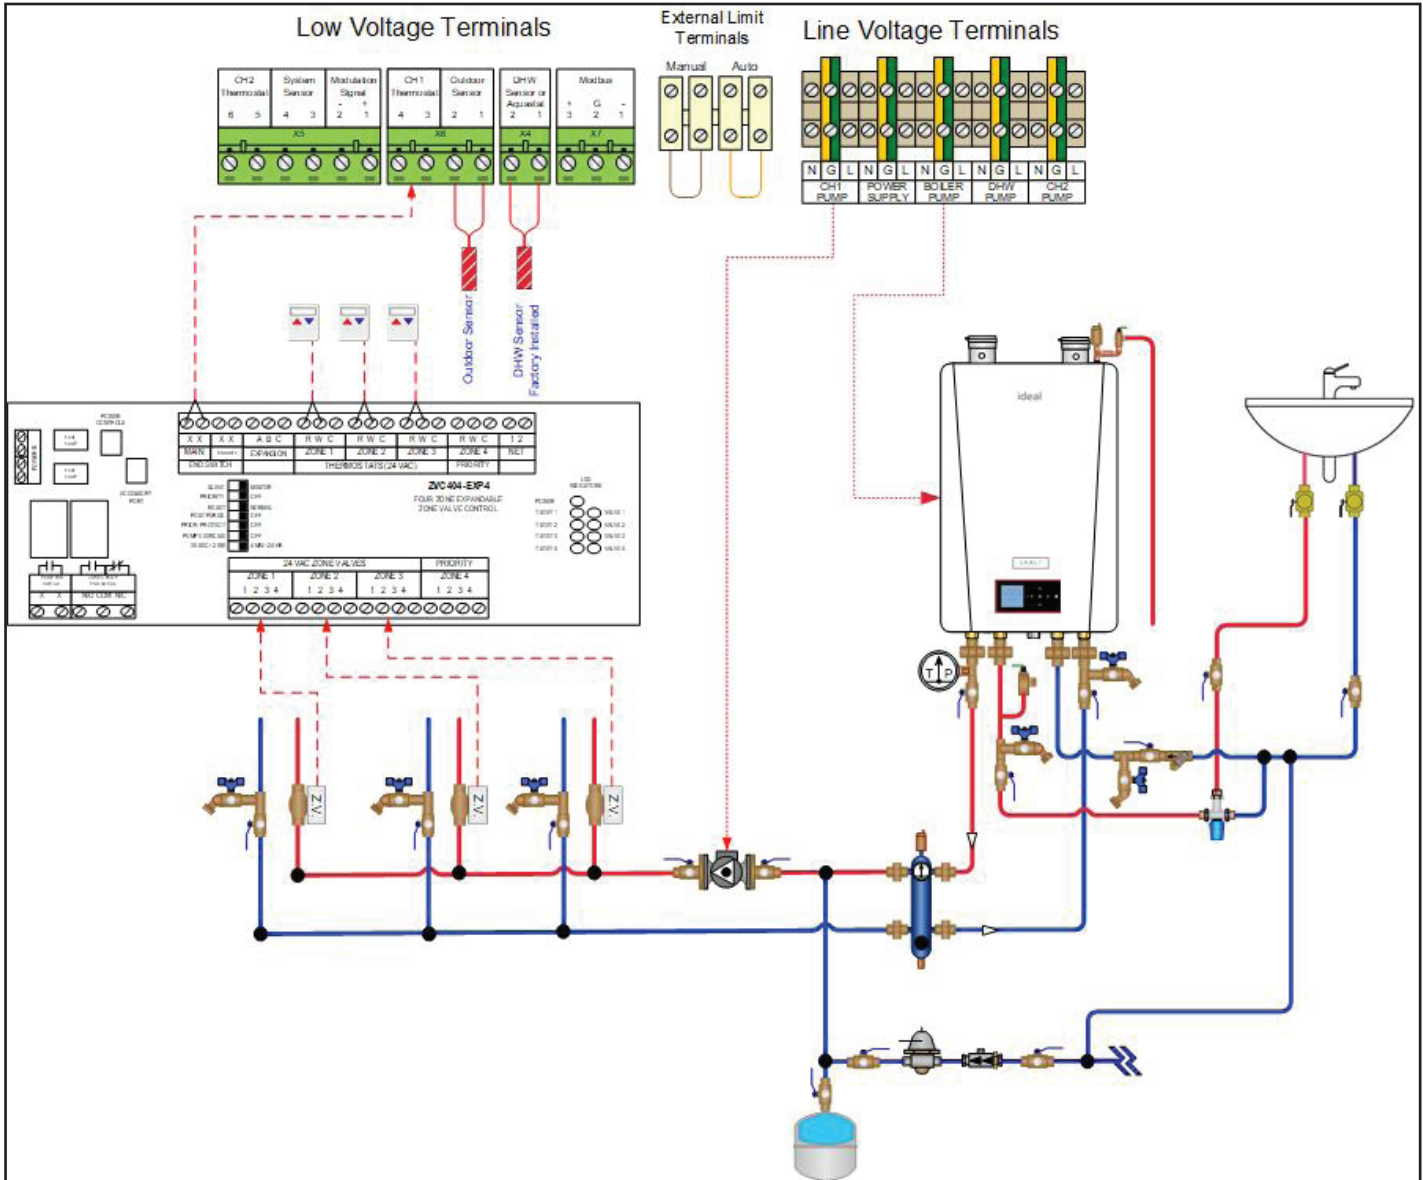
Exalt Combi - Multiple Zones with Zone Valves and Zone Valve Control Panel
